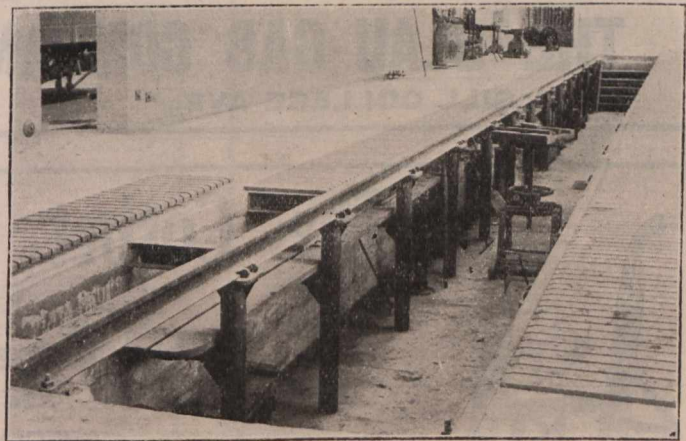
A Repair Pit showing Workmen's Platforms.
